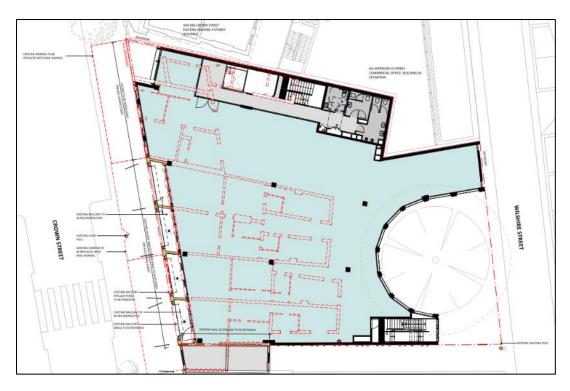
Original DA first floor demolition plan showing new walls in black and retained walls in brown
